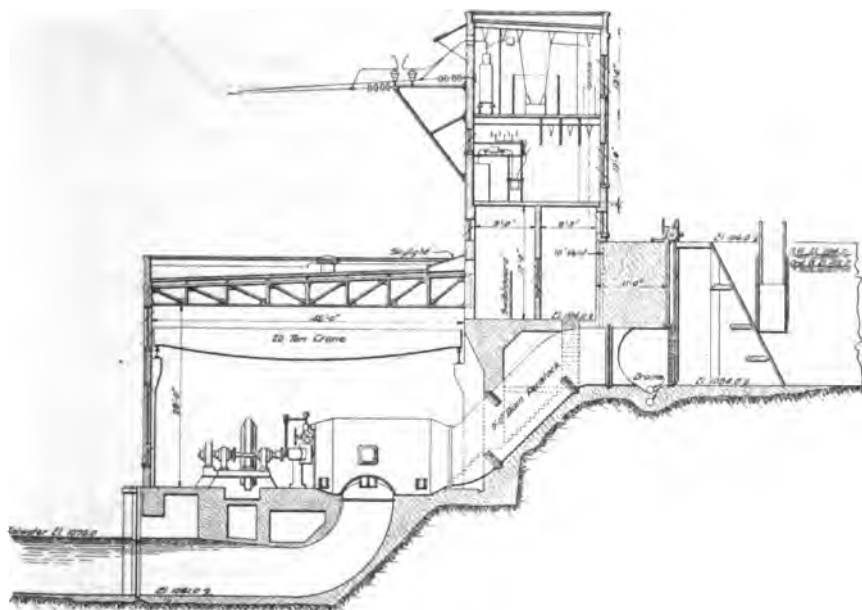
SECTIONAL ELEVATION, TWIN FALLS PLANT.
